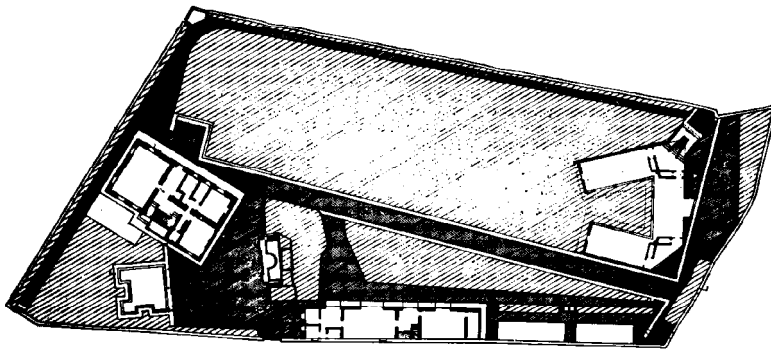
Pavilion for the Oporto Faculty of Architecture: site plan.
